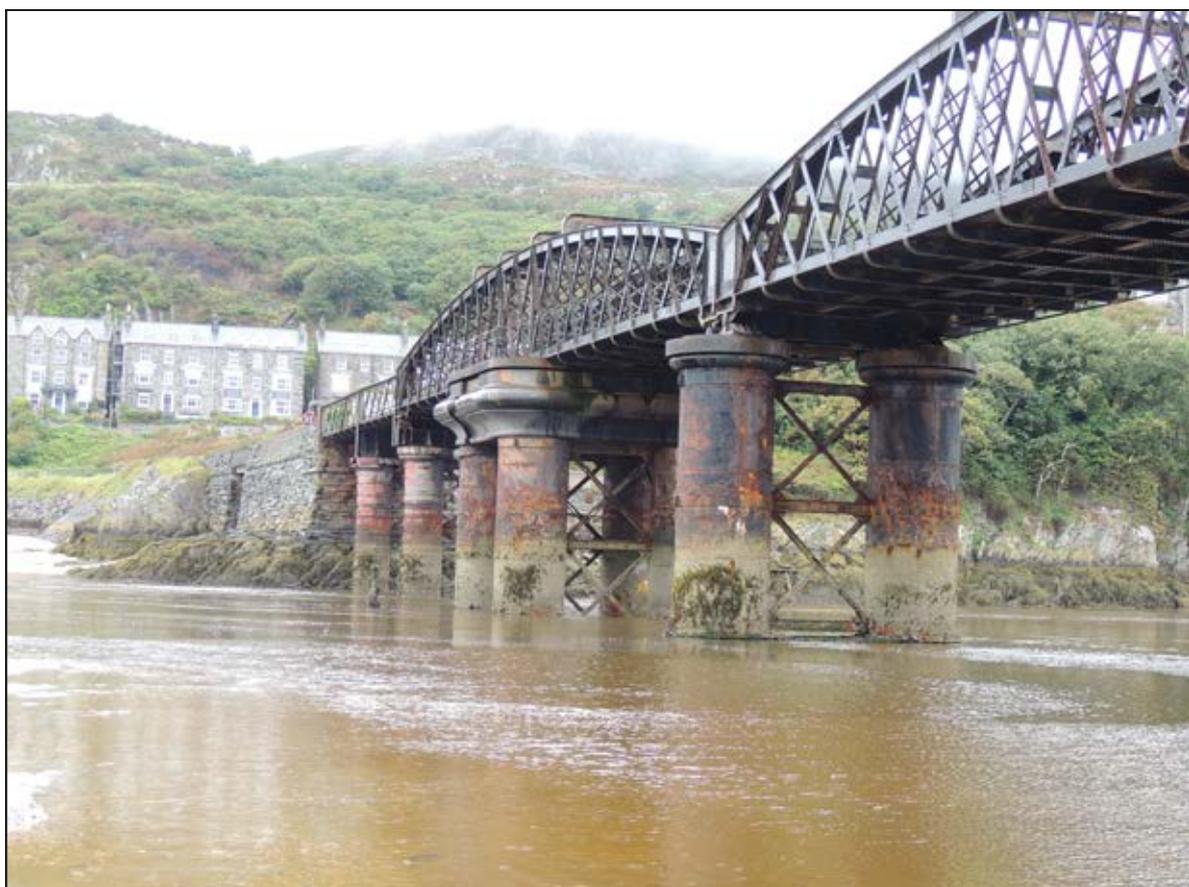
NNE facing shot showing cylindrical piers of swing bridge.
